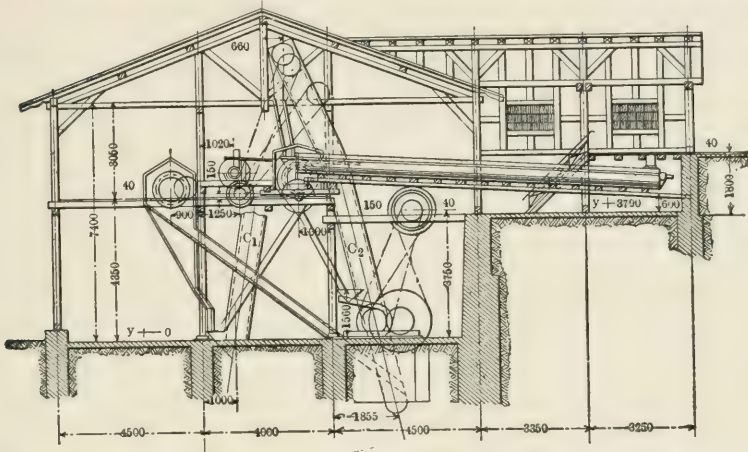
TRANSVERSE SECTION OF SEPARATION WORKS, NEUNKIRCHEN, GERMANY.
